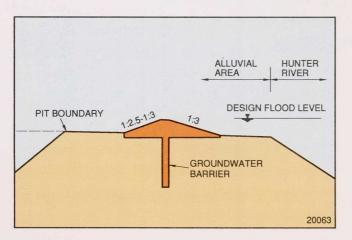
Levee bank with groundwater barrier to be constructed between the Hunter River and the pit
